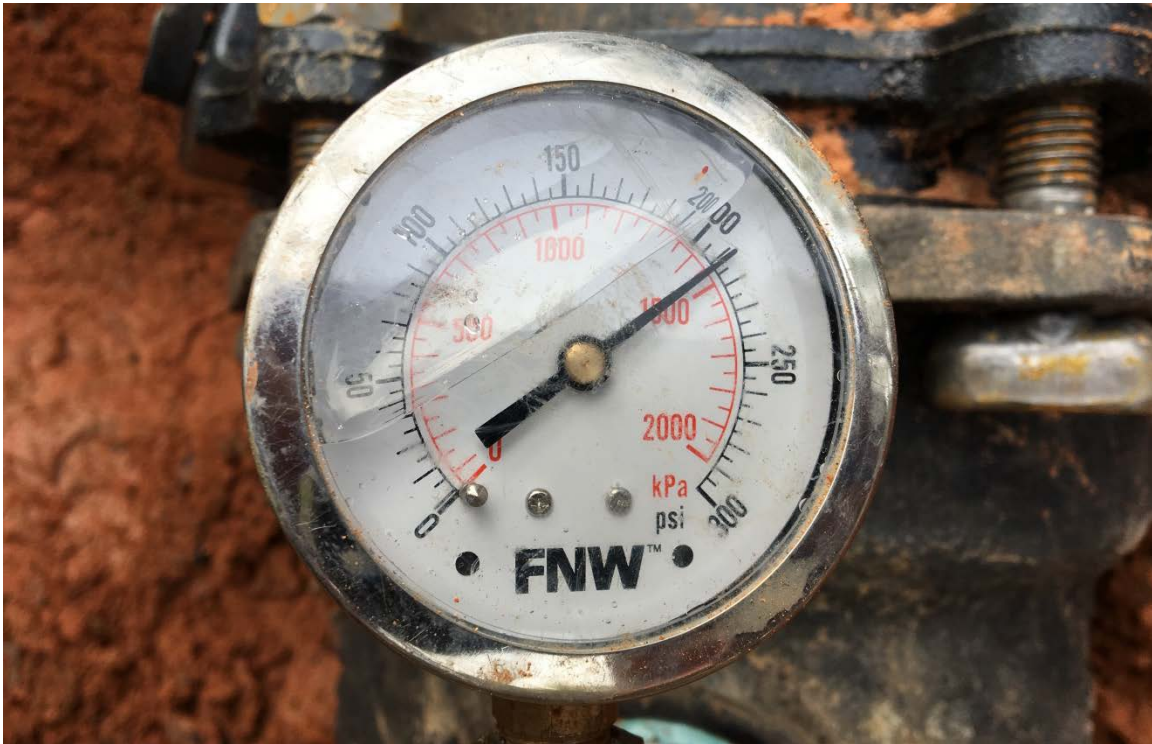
The waterline is undergoing a second pressure test. It's a two hour test overseen by Fayette County Water System.
